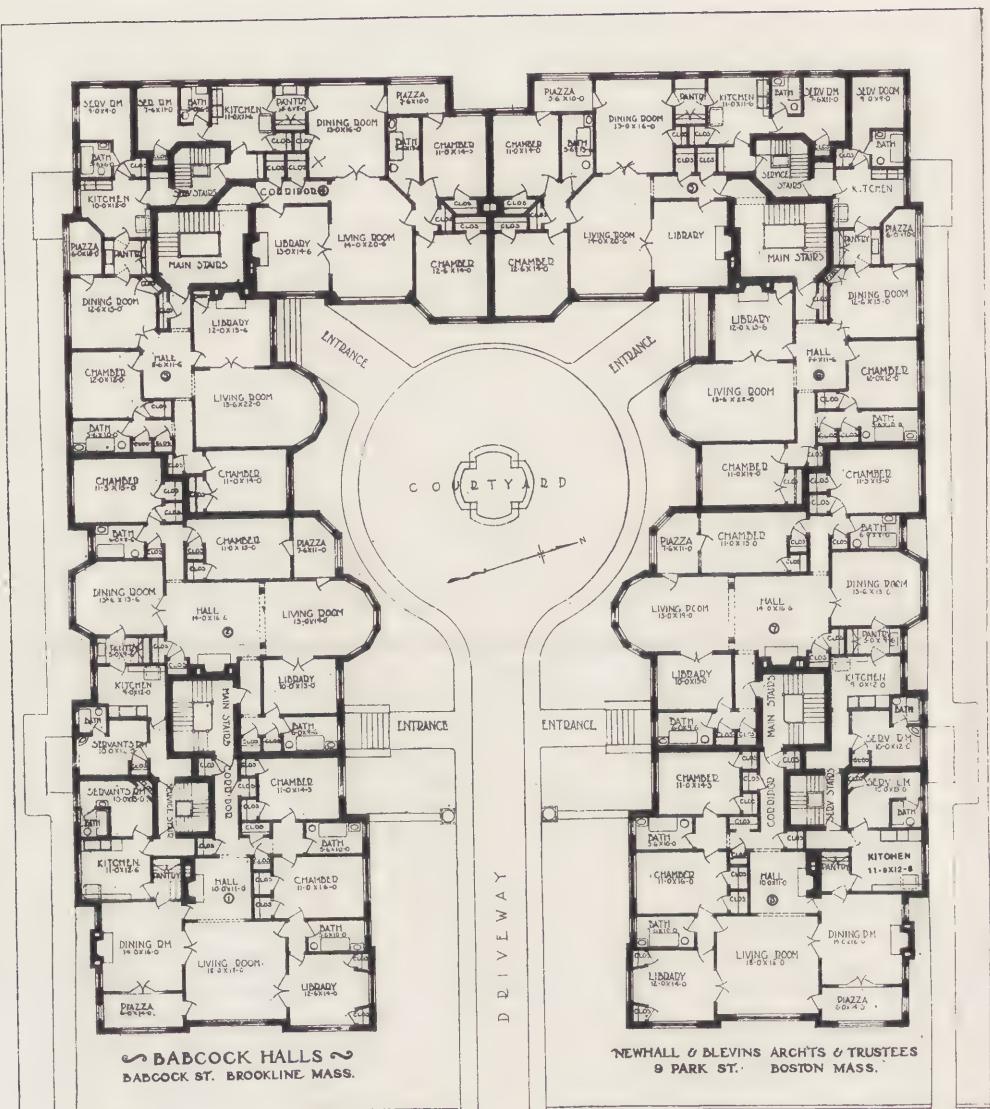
PLAN OF BABCOCK HALLS, BROOKLINE,
